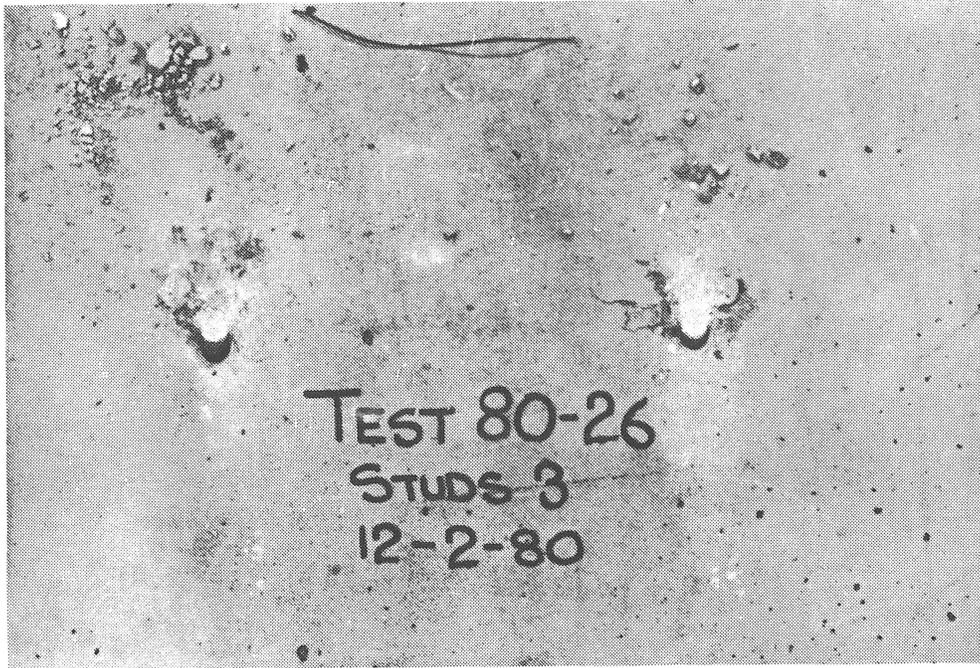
Specimen S-3. Sheared Studs in Concrete After Test
